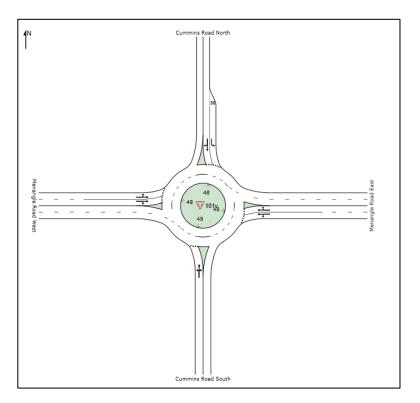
Indicative Menangle Road/ Cummins Road intersection layout
